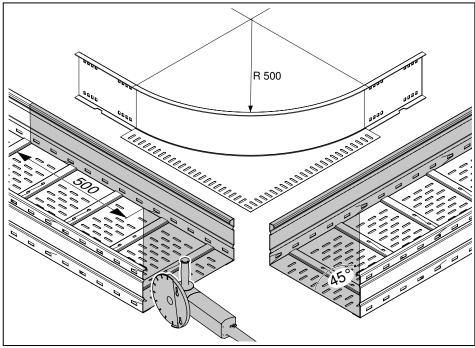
Cutting the wide span cable tray for a corner extension piece
